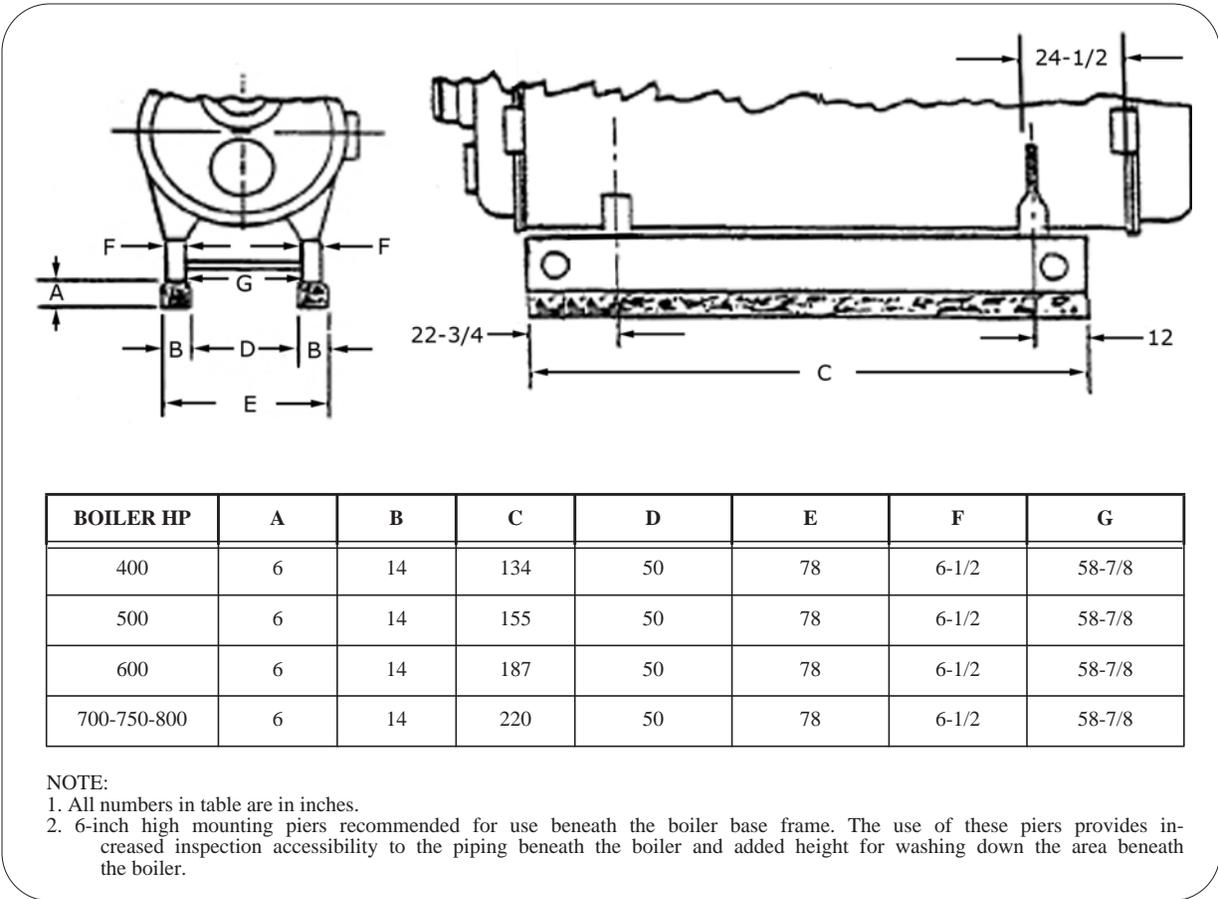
Model CB-LE Boiler Mounting Piers (96")
